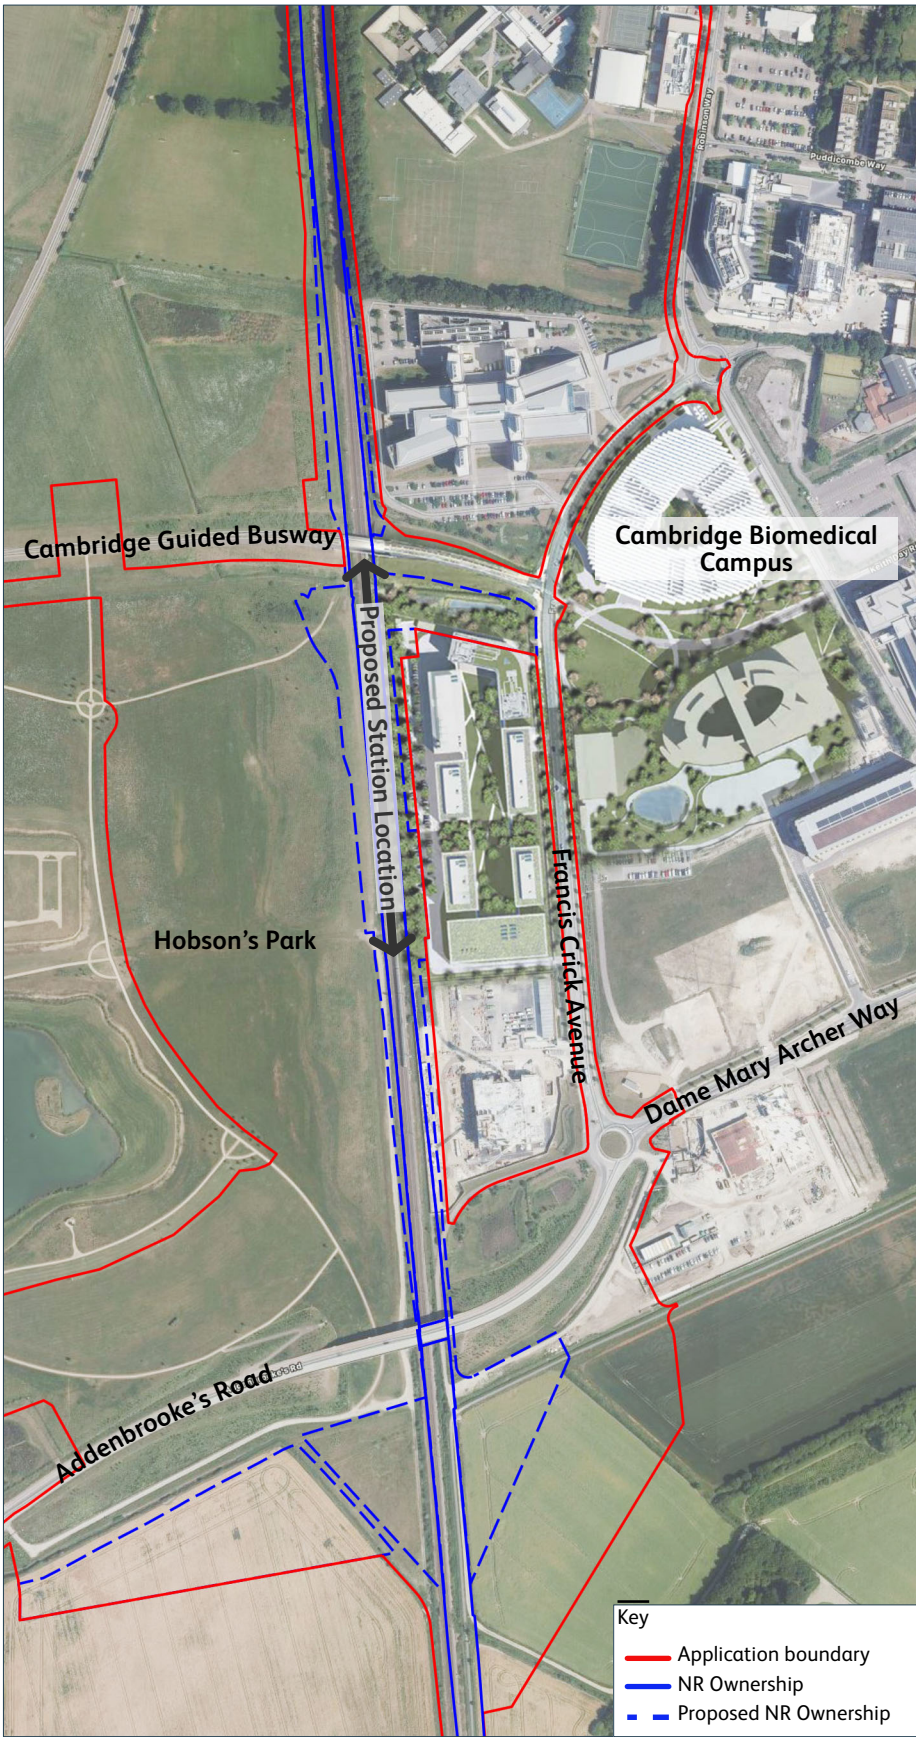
Aerial showing existing site plan of station with future CBC shown.
